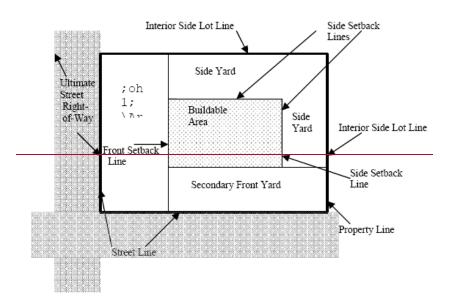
CORNER LOT SETBACKS AND YARDS
